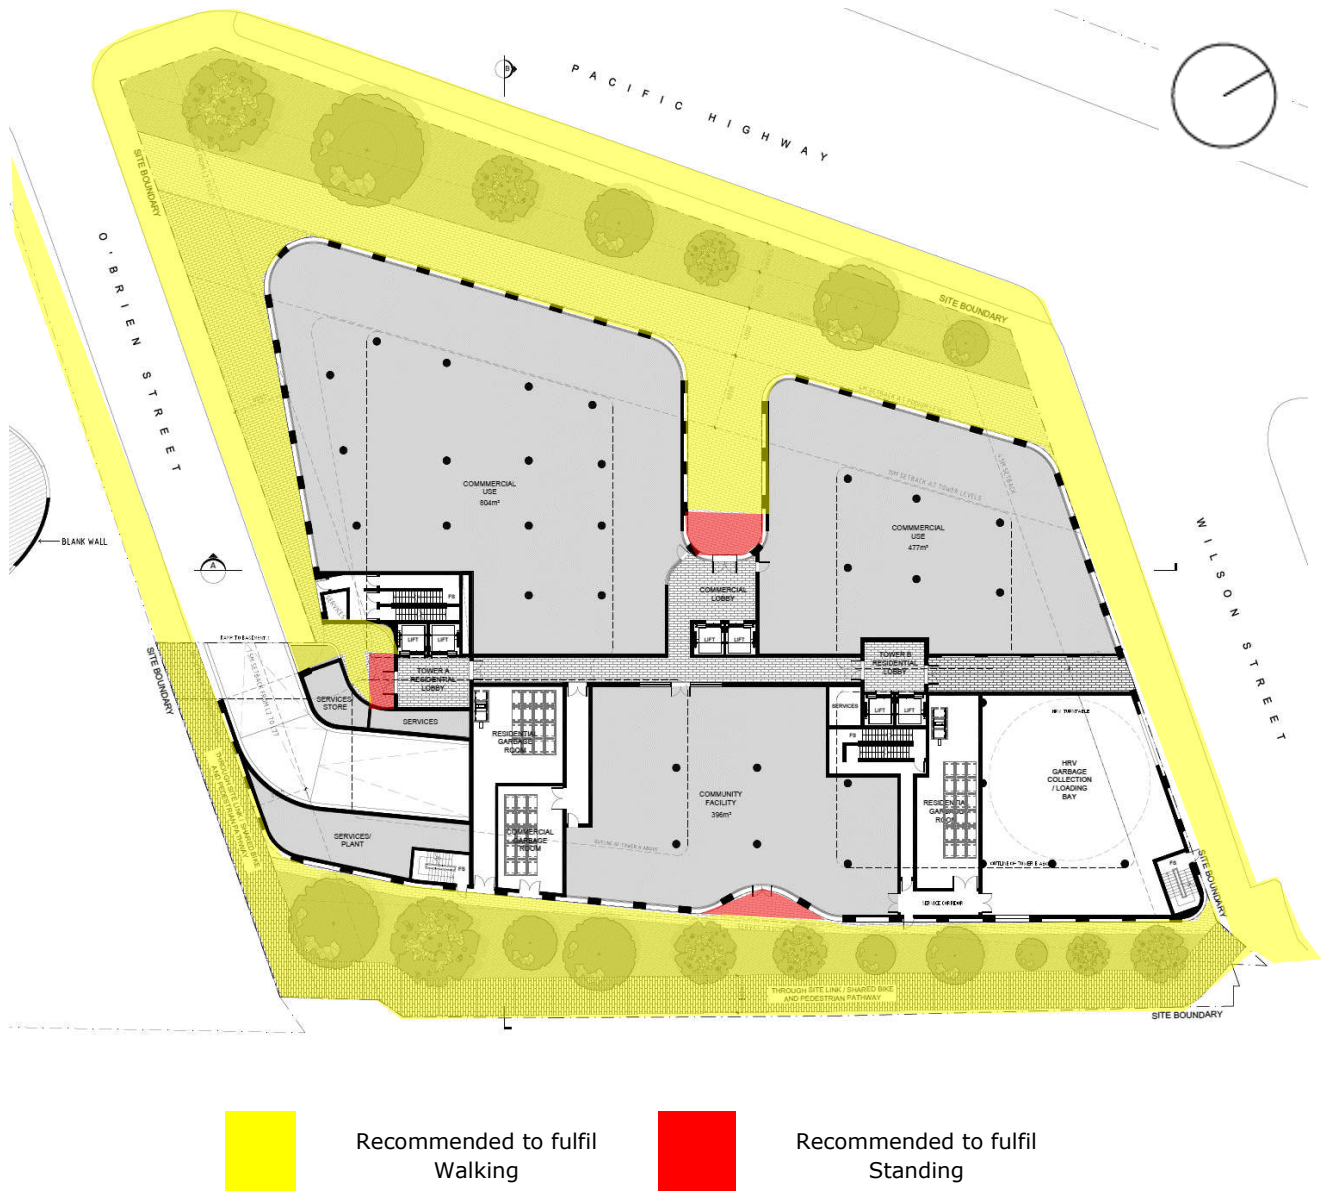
Ground floor plan of the proposed development with the recommended wind criteria overlaid.
